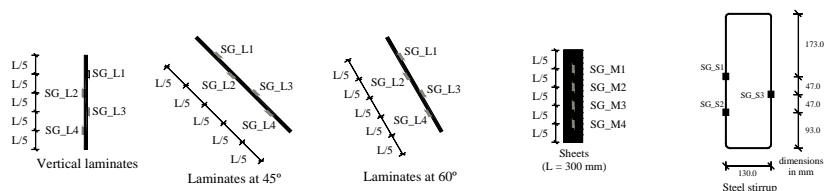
Positions of the strain gauges in the laminate, strip of sheet and stirrup
